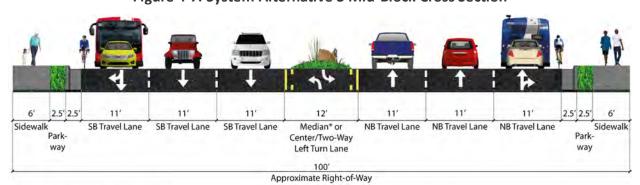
System Alternative 3 Mid-Block Cross Section
